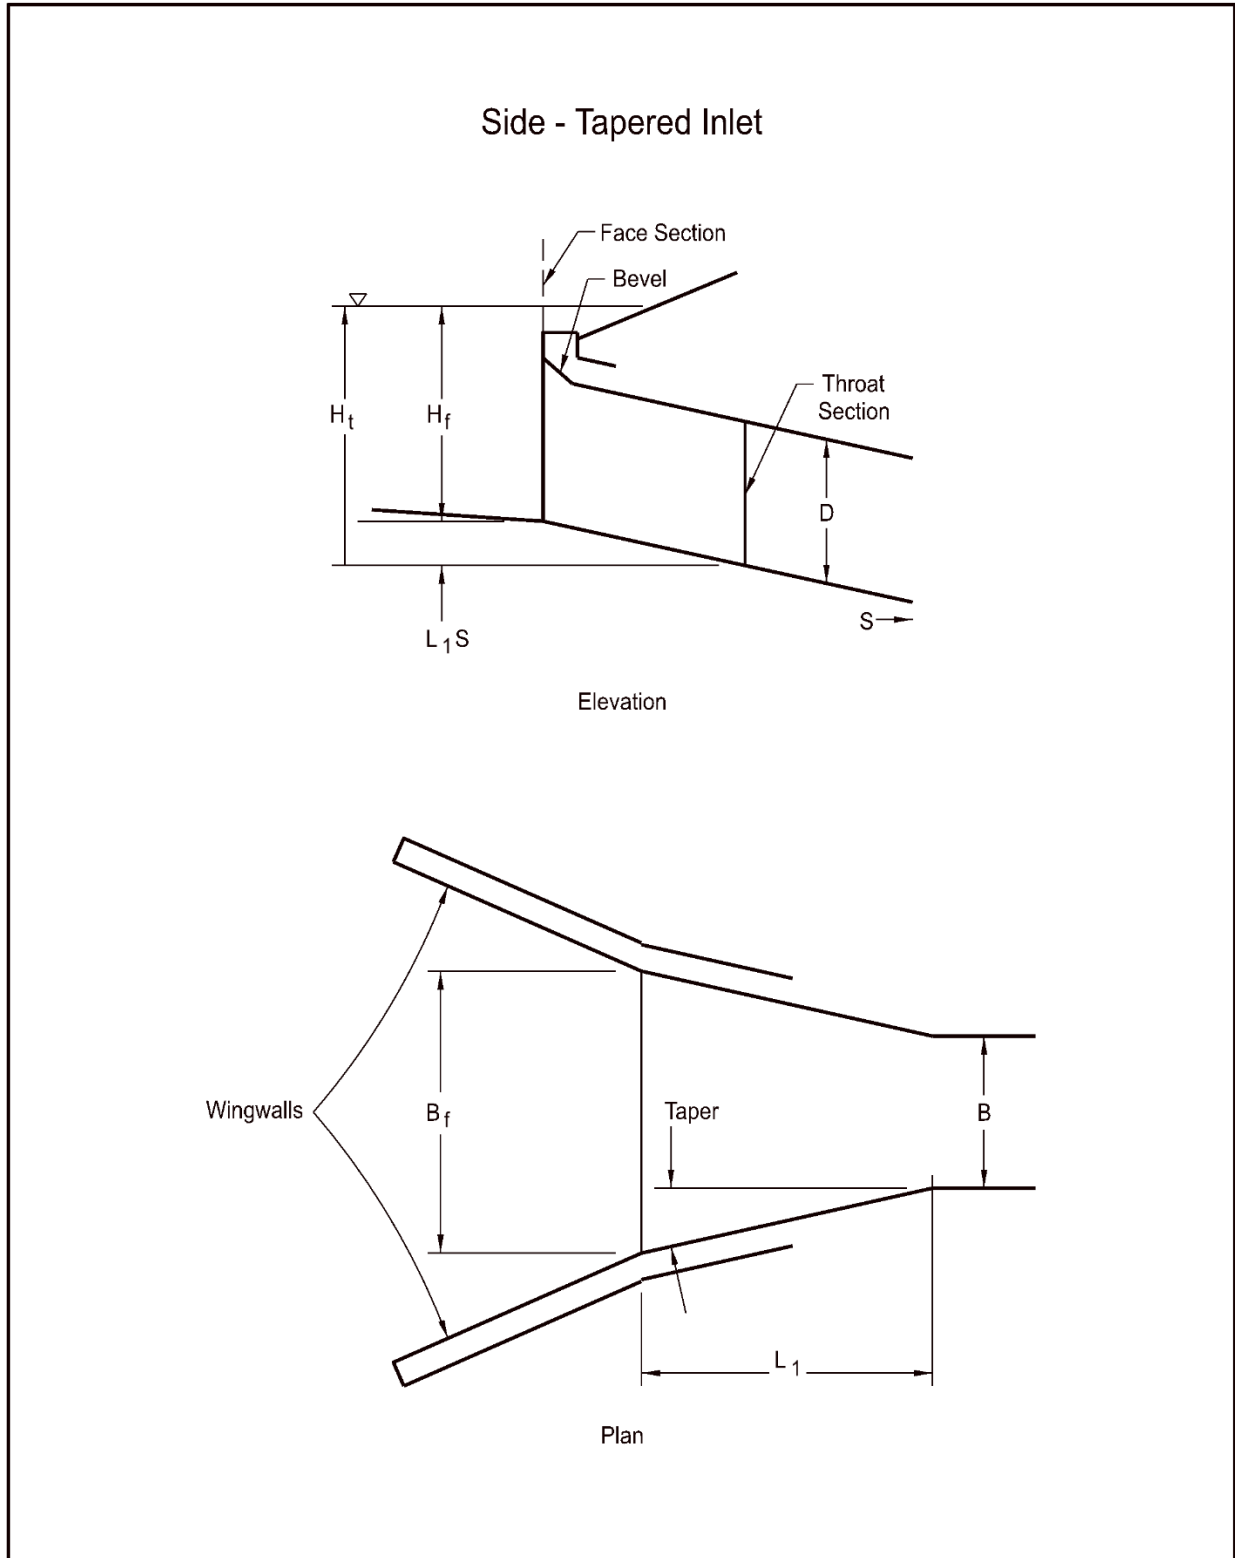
Side-Tapered Inlets (Source: Ref. 1.11)
